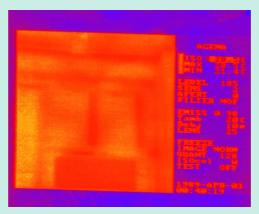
Thermograph of top floor ceiling – dark areas correspond to gaps and poorly laid insulation
